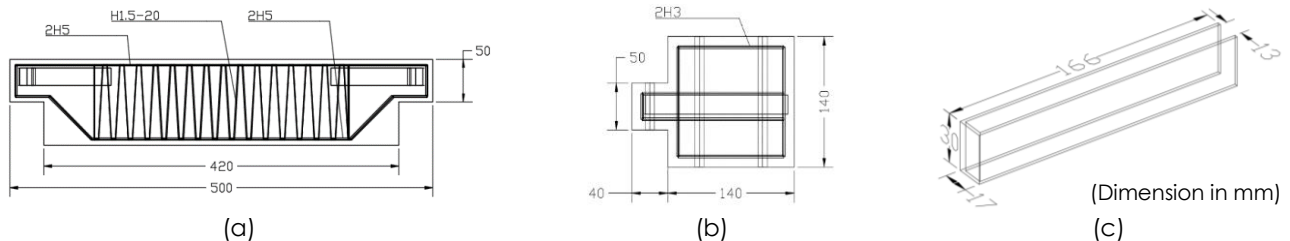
Detailing of (a) Beam, (b) T-block Column & (c) New Steel Column Anchor Plate
